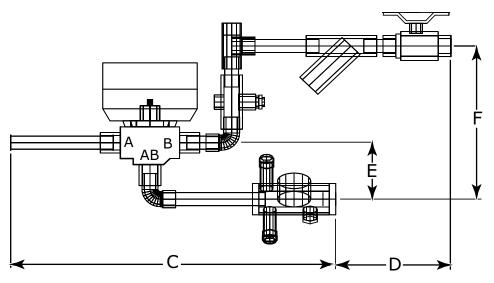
Three-way 1/2-in. and 1-in. valve deluxe piping package
